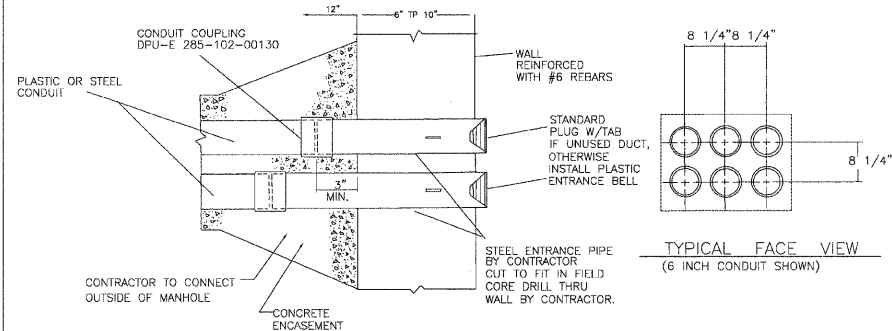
ENTRANCE IN MANHOLE/HANDHOLE (NEWER STYLE)
